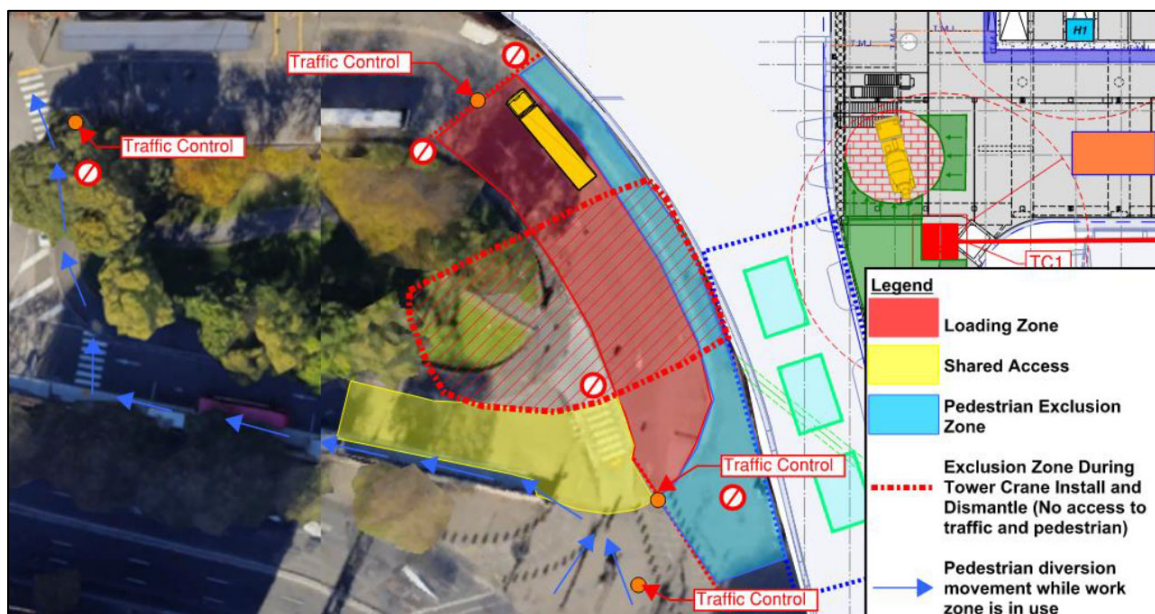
Railway Colonnade Drive works zone during tower crane erection
